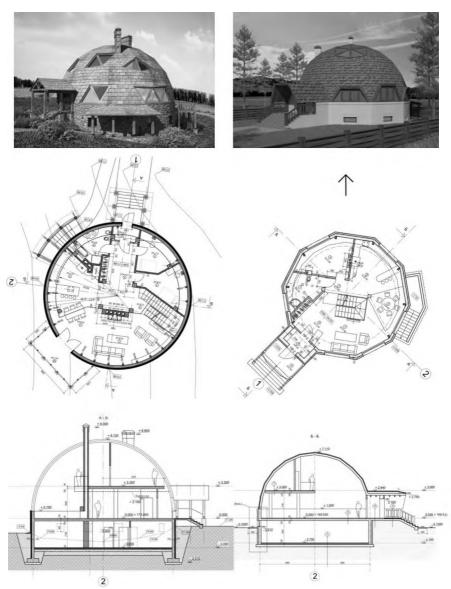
Software: AutoCAD 2017.Private houses based on the concept of the geodesic domes (Kyiv oblast, Ukraine). Architect B. Kutsevych, general views, ground floor plans, section. Source: Author. 2017.
